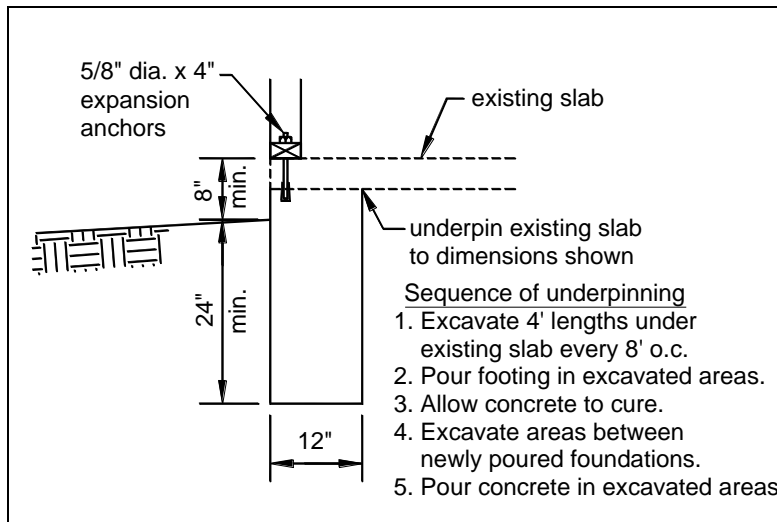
TYPICAL UNDERPINNING DETAIL
